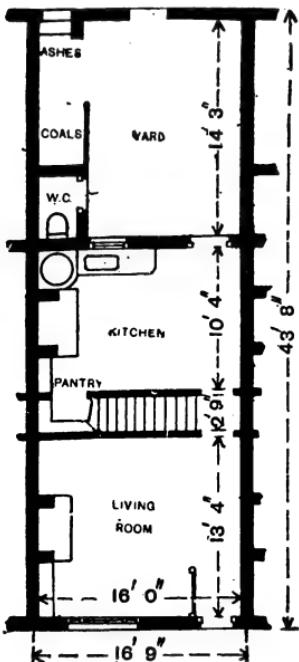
Ground Plan of 16-ft. 9-in. House.
